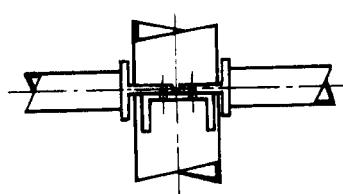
Detail 1 (length adjustment can be made by means of spacers)
